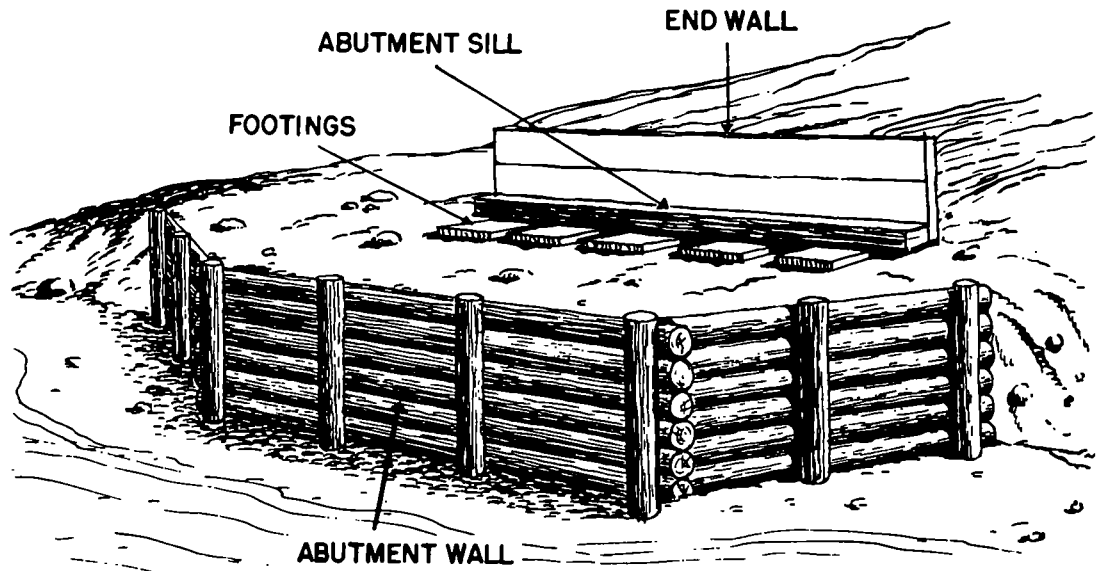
Typical earth abutment, with timber abutment sill and end wall.
